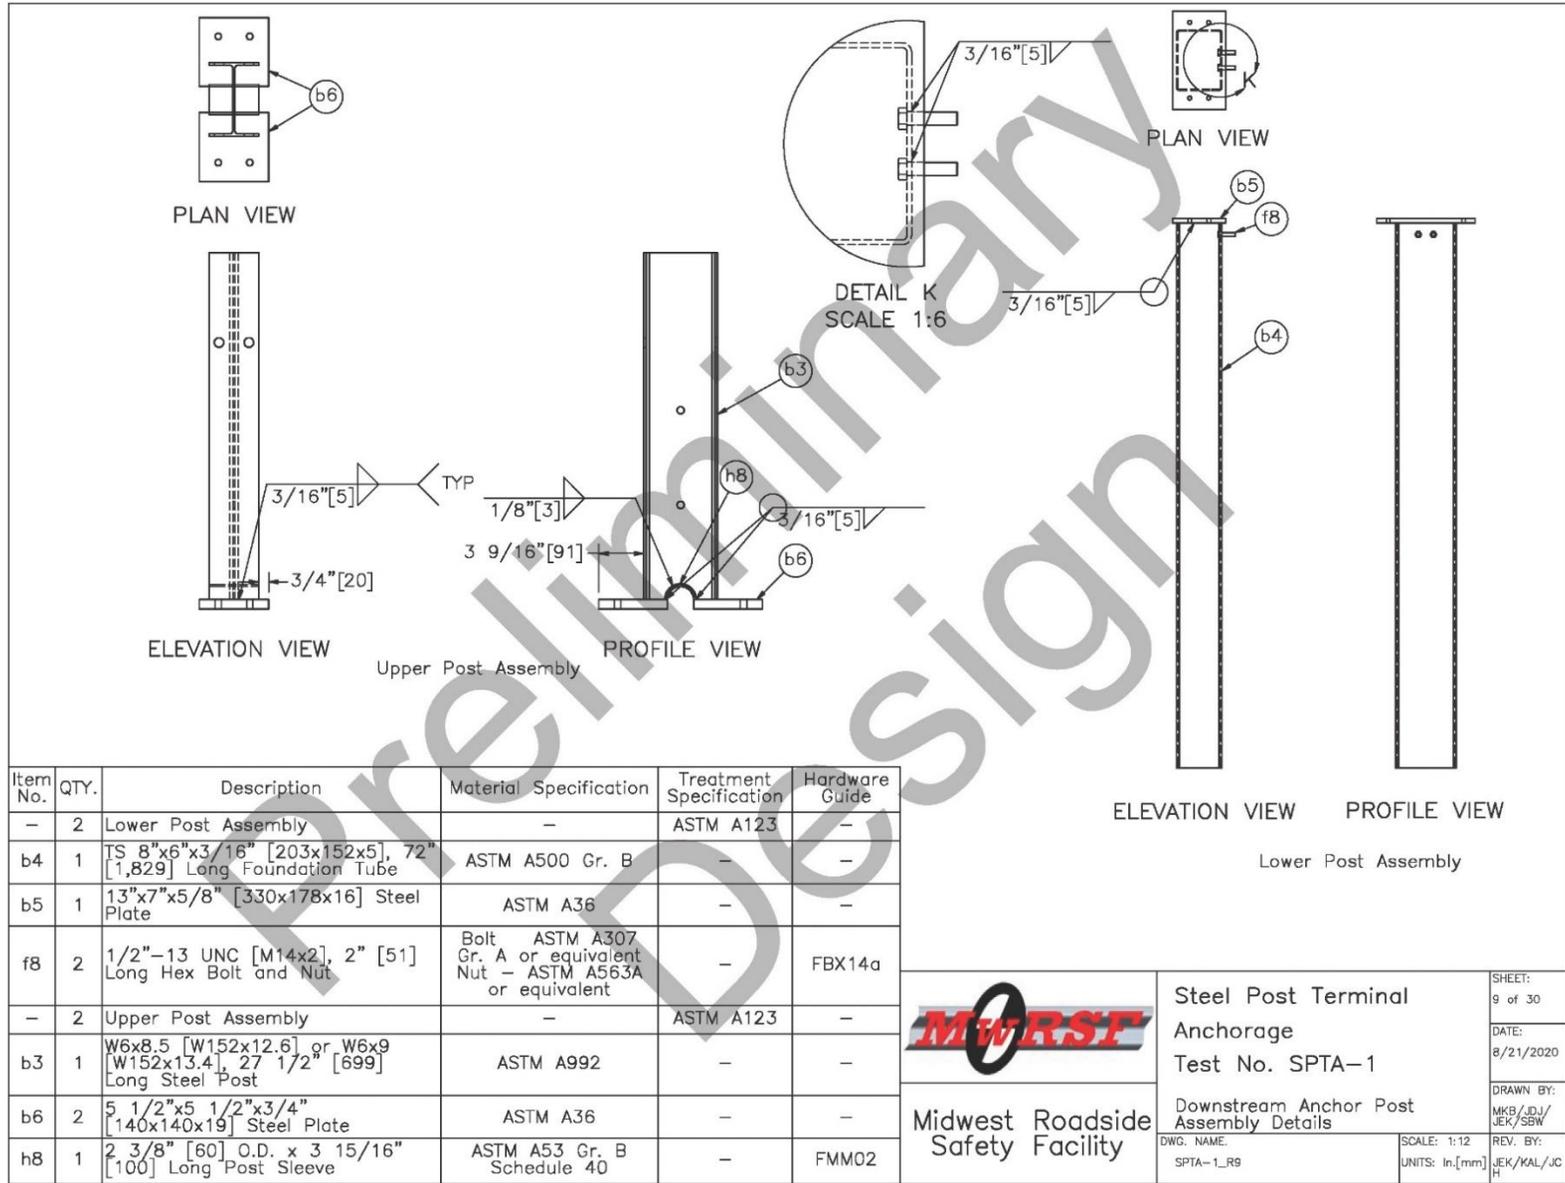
Downstream Anchor Post Assembly Details, Test No. SPTA-1
